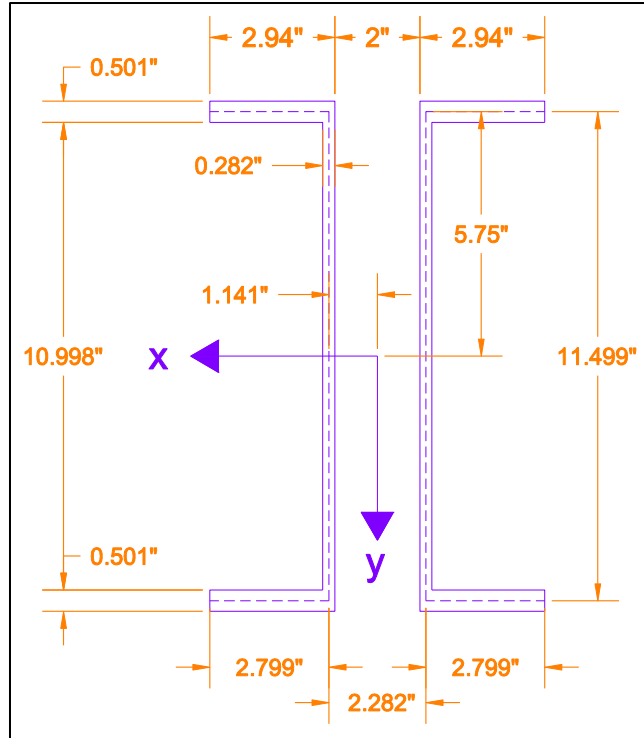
Longitudinal plane cross section view of built-up load transfer channels
